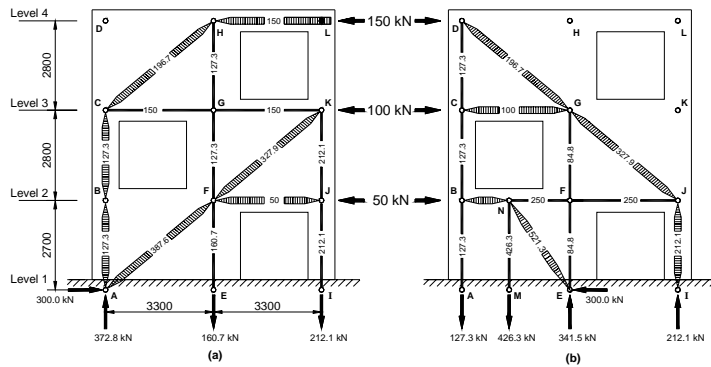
Strut and tie models for determining design actions for masonry walls having irregular openings (Voon and Ingham 2004).
